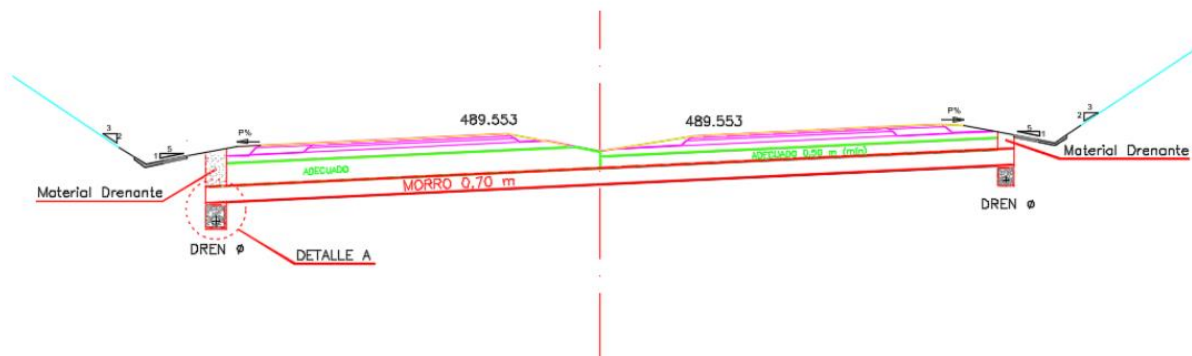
Section plan with detail of Figure 1 kilometre points: 19+620-20+800.
